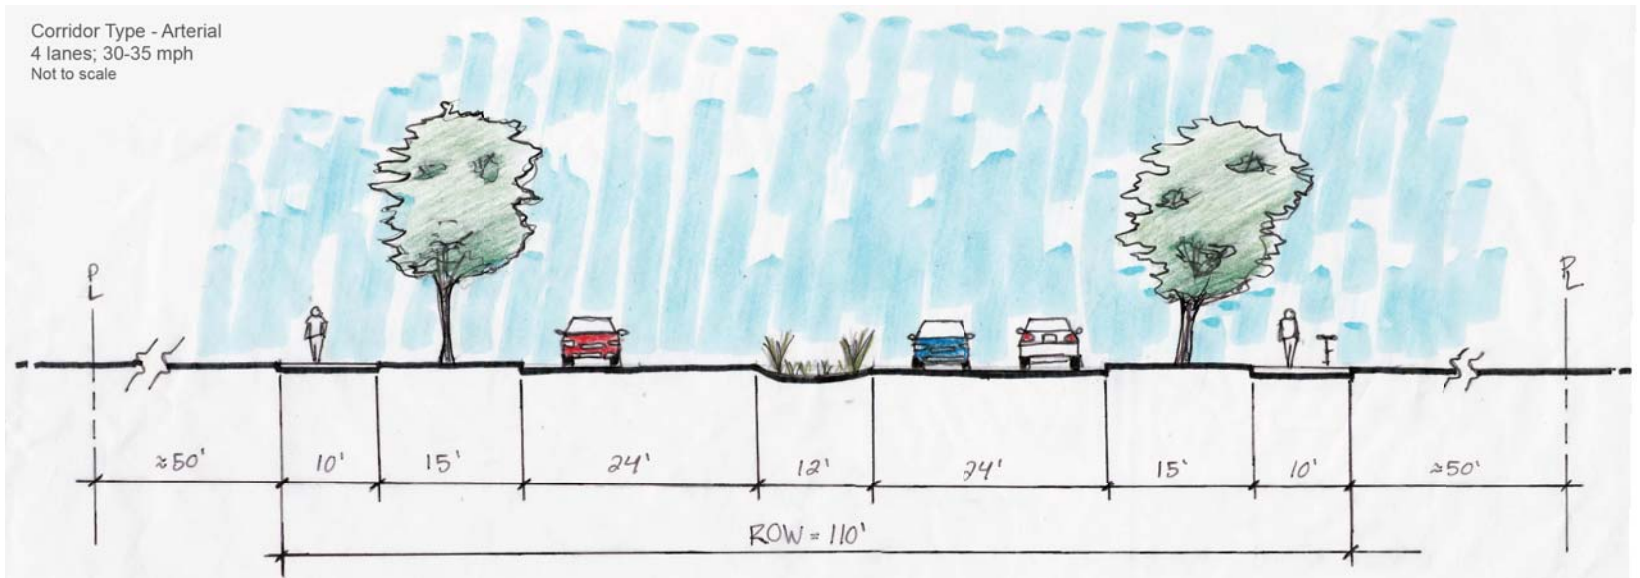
Arterial Street Section. Source: Drawn by author.
